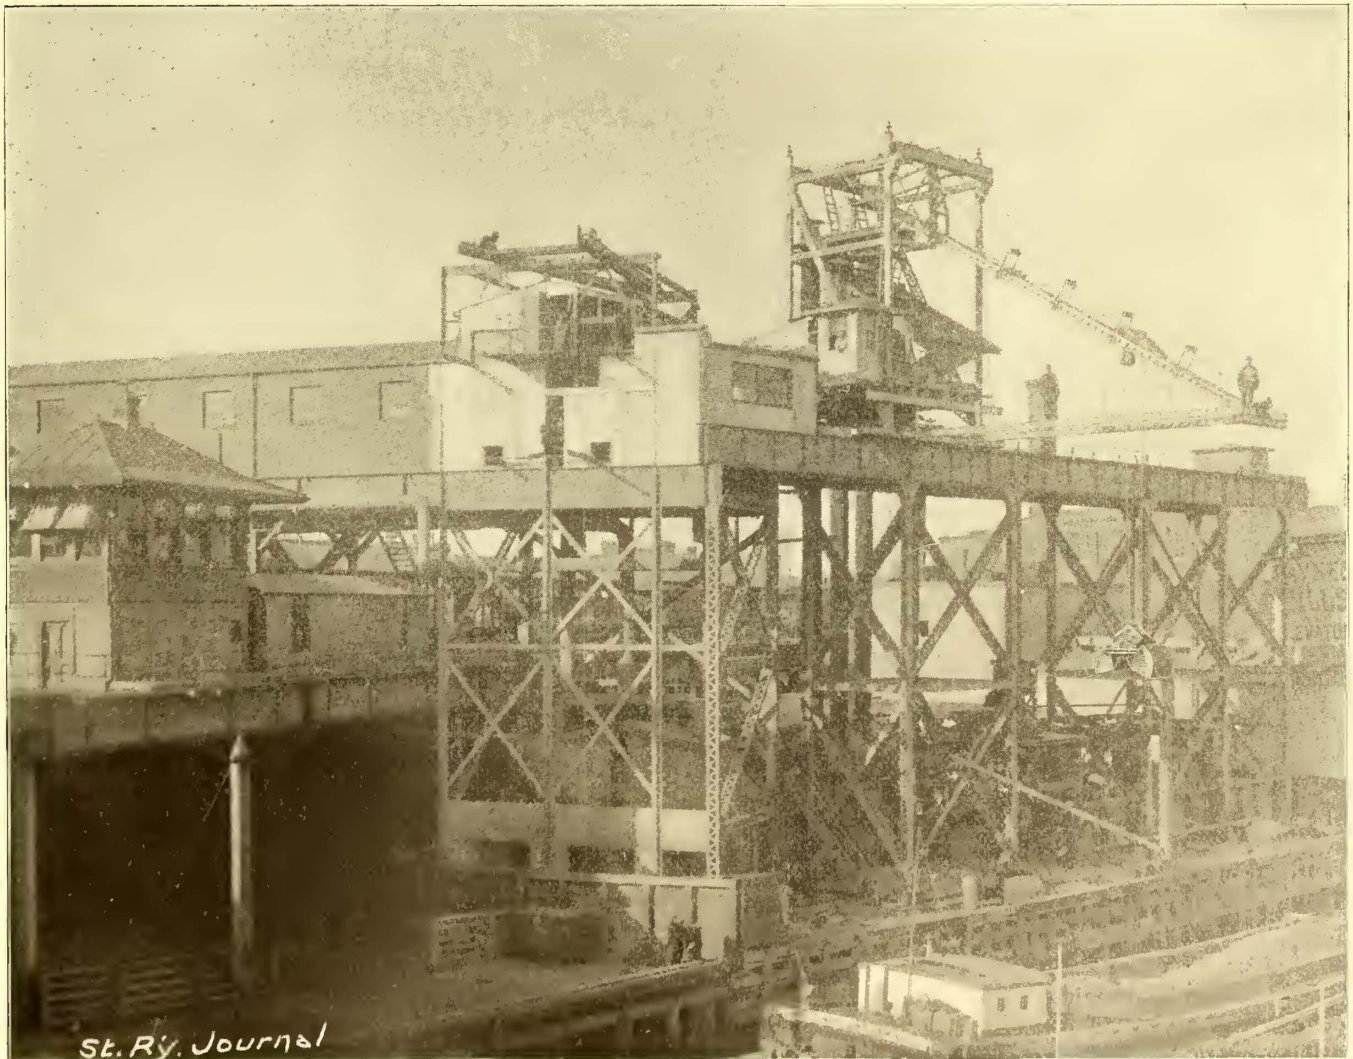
COALING STATION OF SECOND AND THIRD AVENUE ELEVATED RAILWAYS, NEW YORK.
